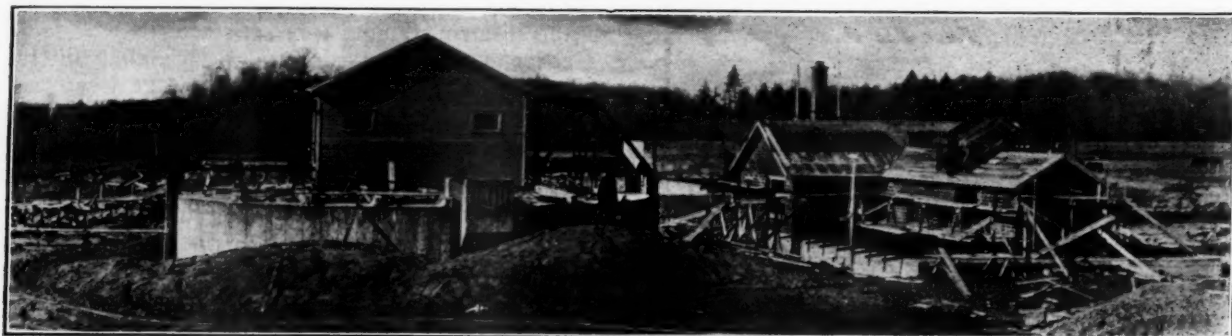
ANTIGO PLANT UNDER CONSTRUCTION
